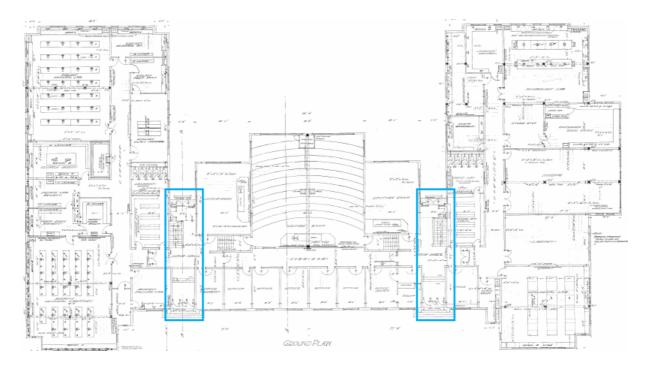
Ground plan highlighting the sections of building torn down for firewall installation
